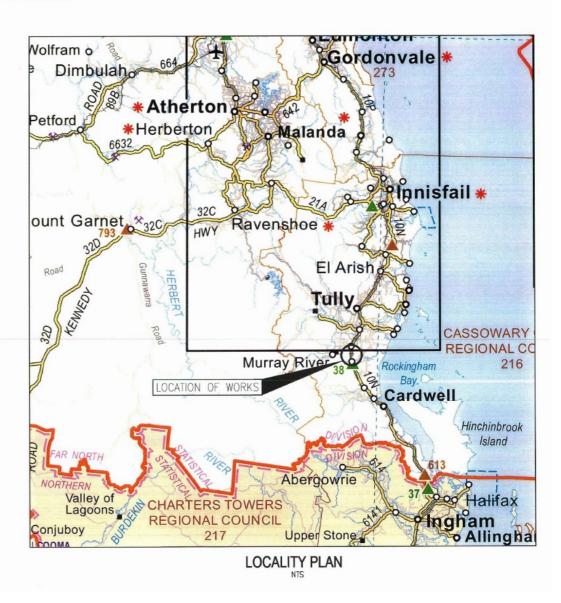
(b) – Locality plan and drawing list – generic example 2
